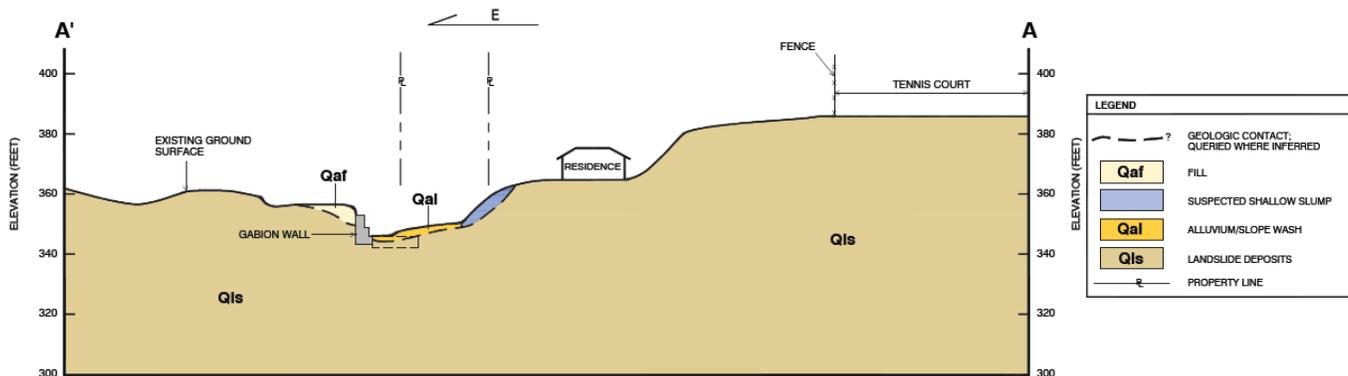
Cross section taken at existing Gabion Wall (south of Sweetbay Road)
